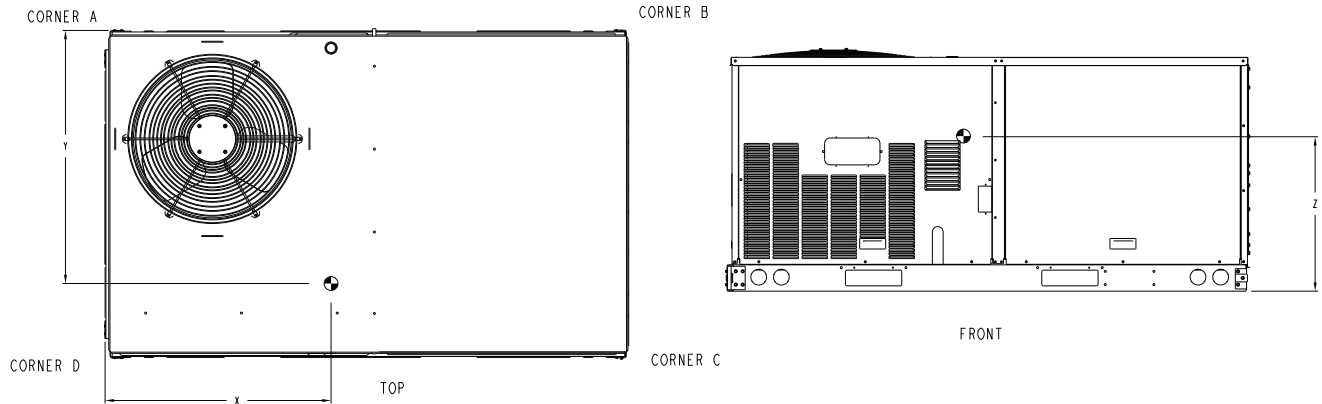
Dimensions RAS 036-072 (Sheet 2 of 2)
